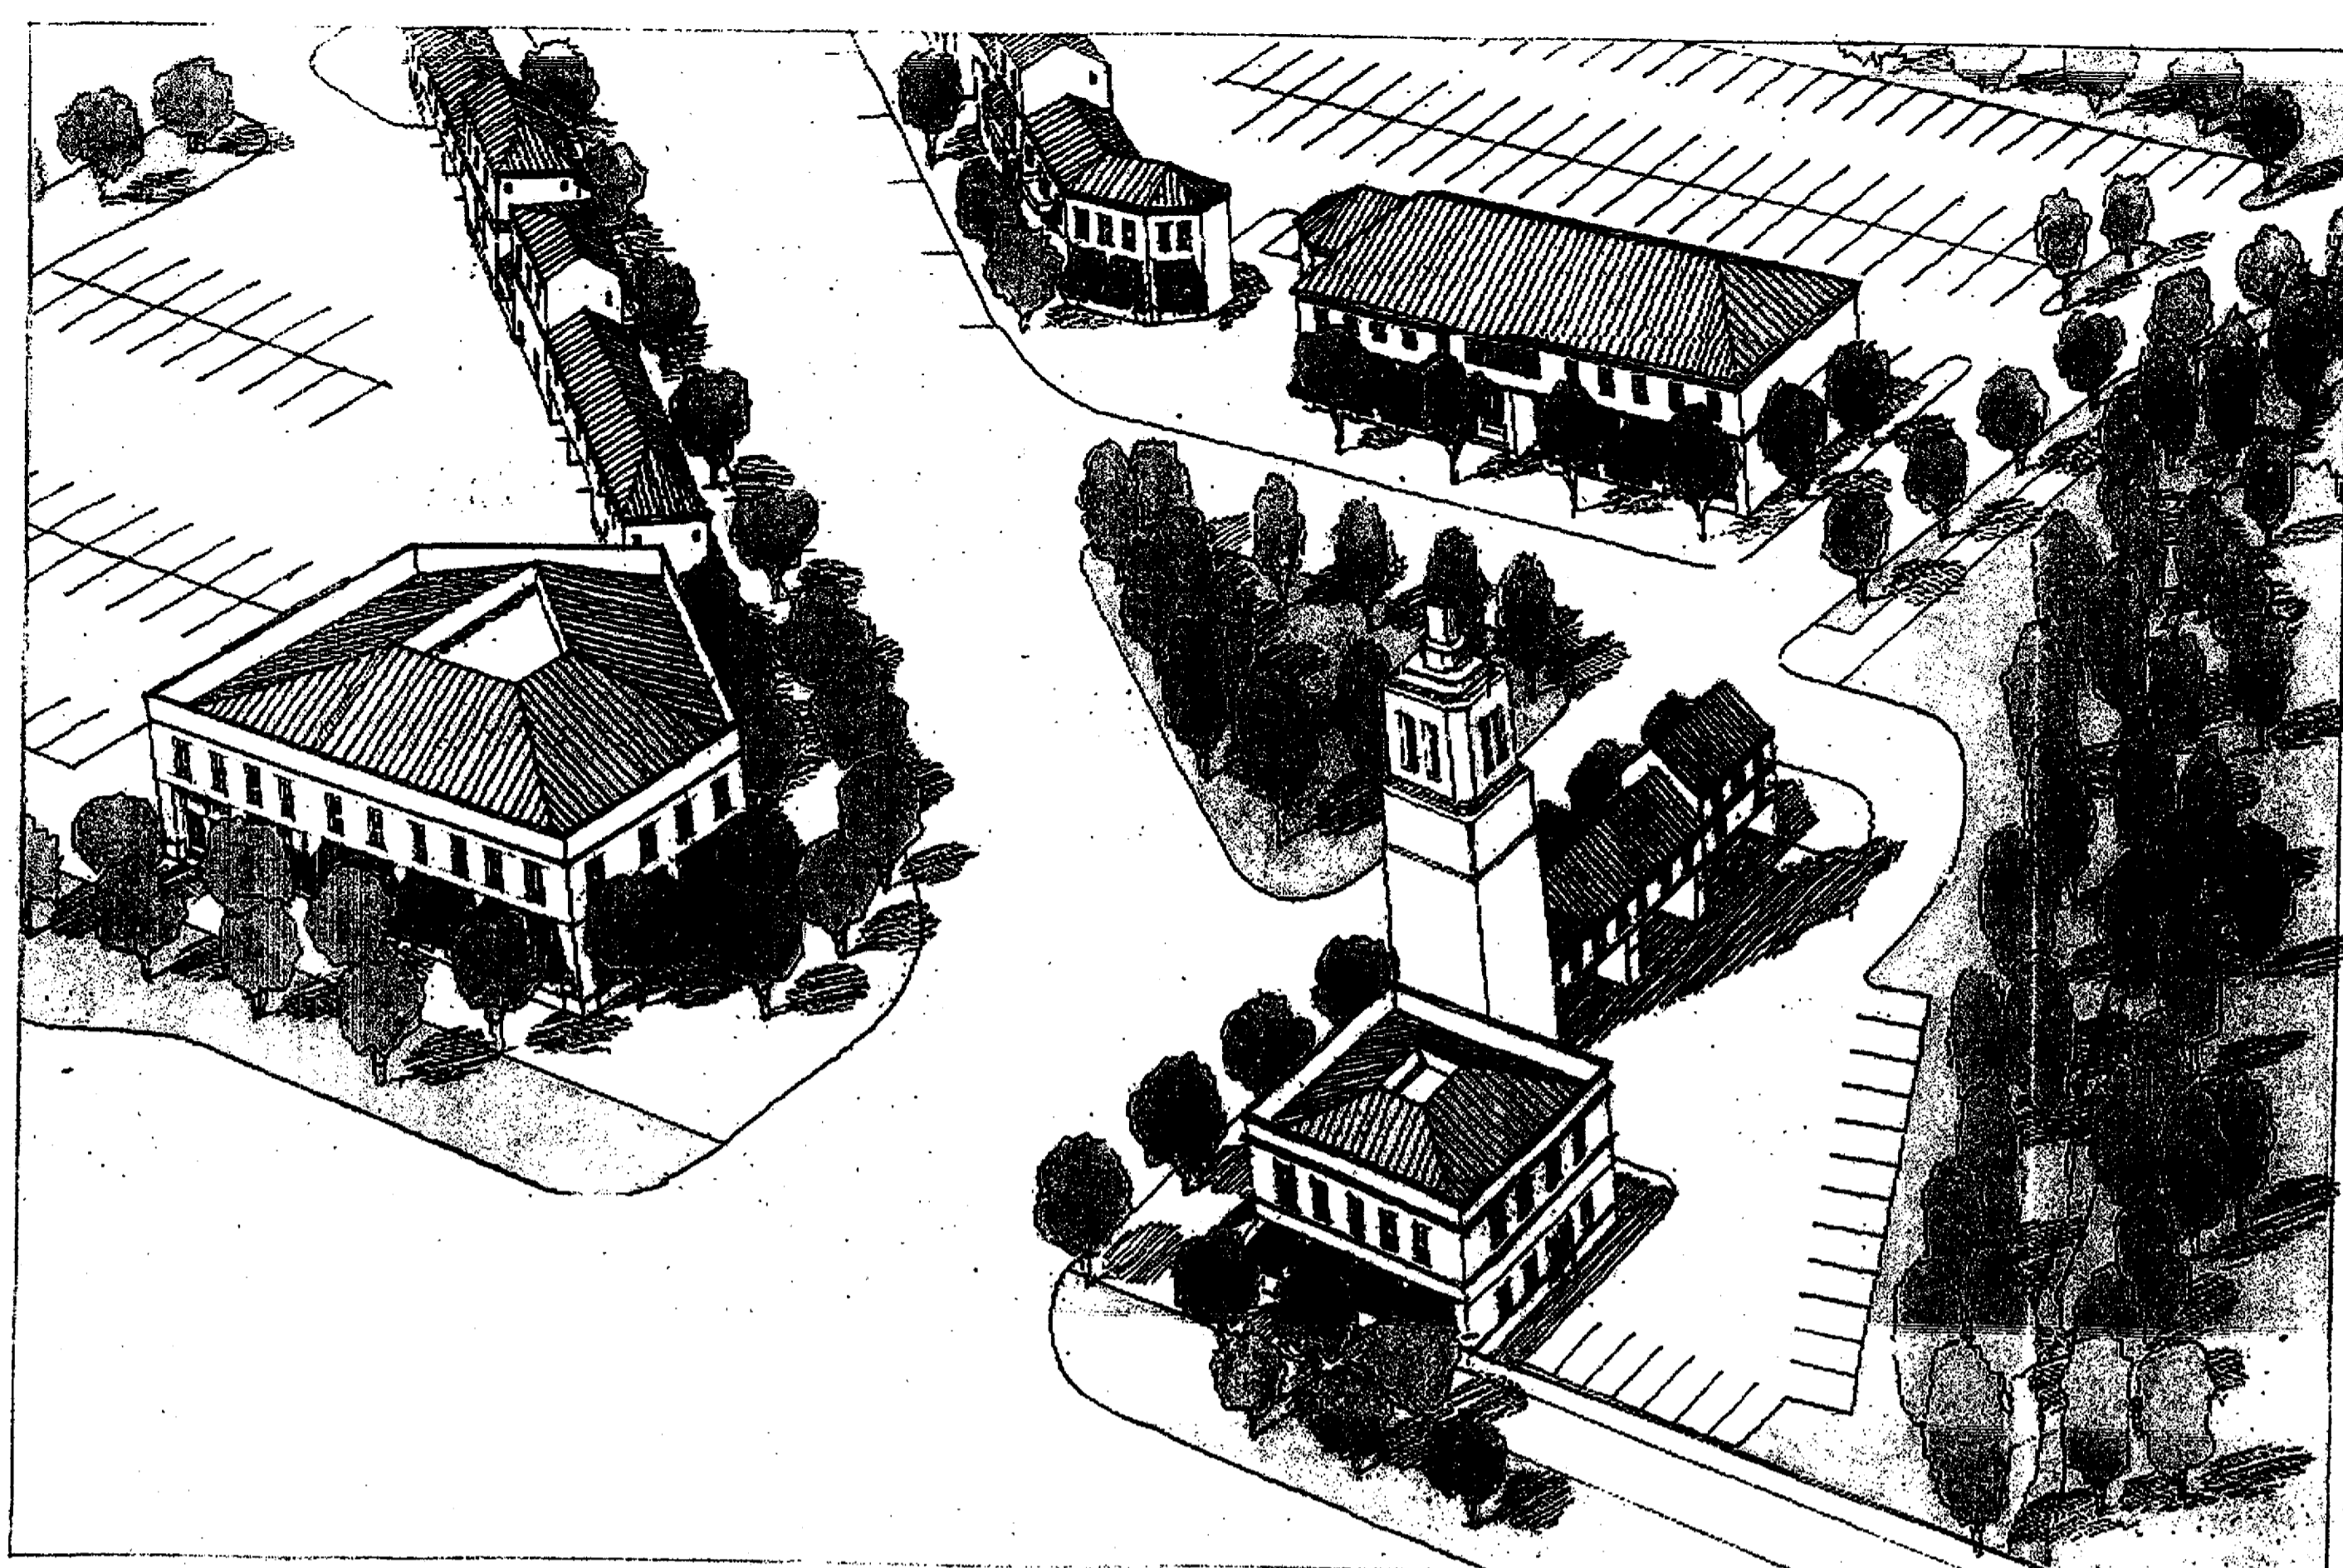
DETAIL A: ILLUSTRATIVE CIRCUITOUS PARKING & BUILDING SCHEME
